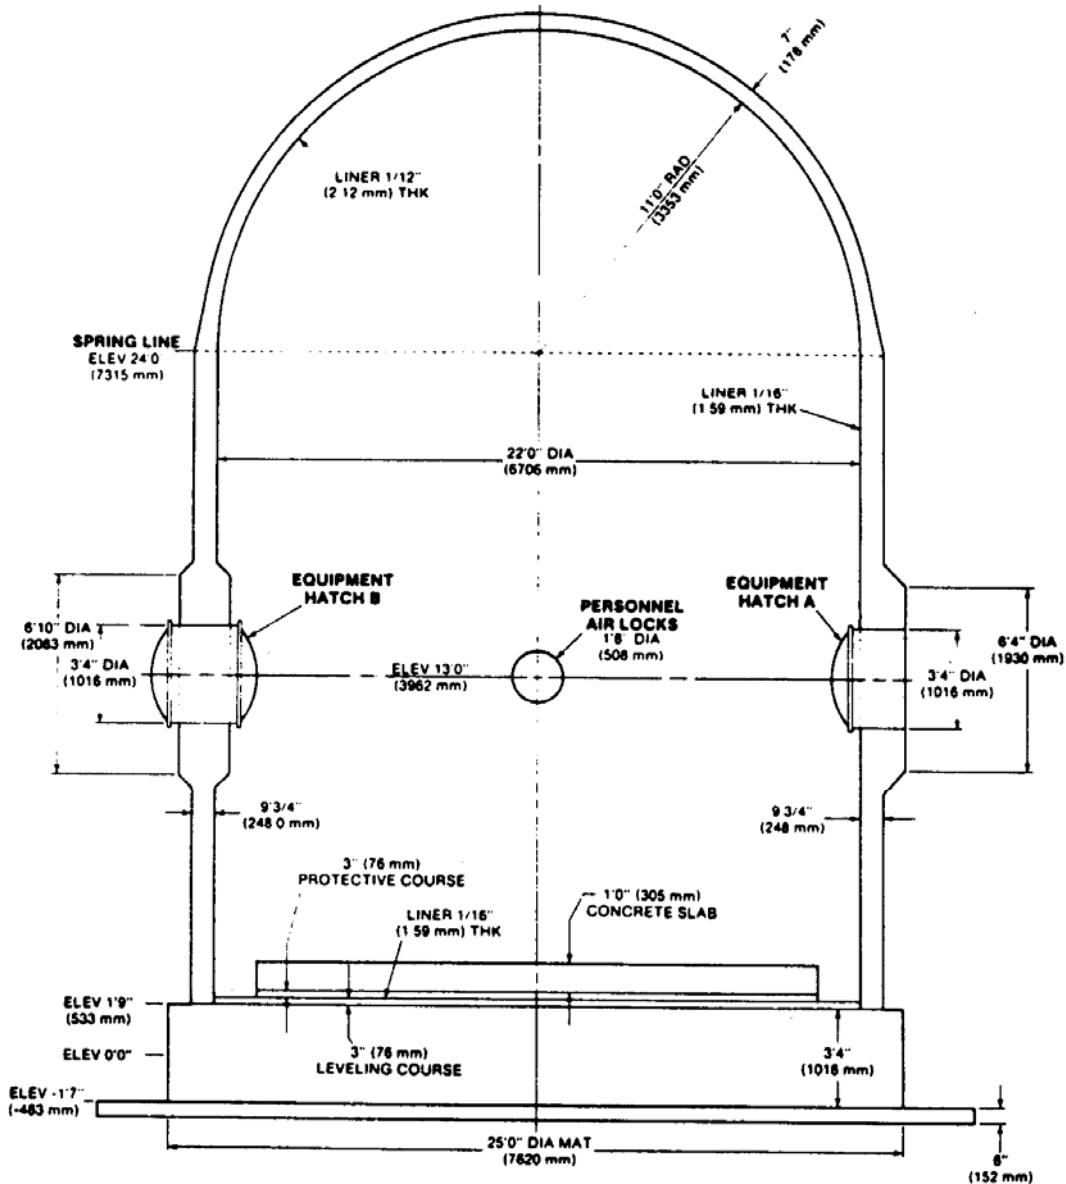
Cross-section of the 1:6-Scale Reinforced Concrete Containment Vessel Model
